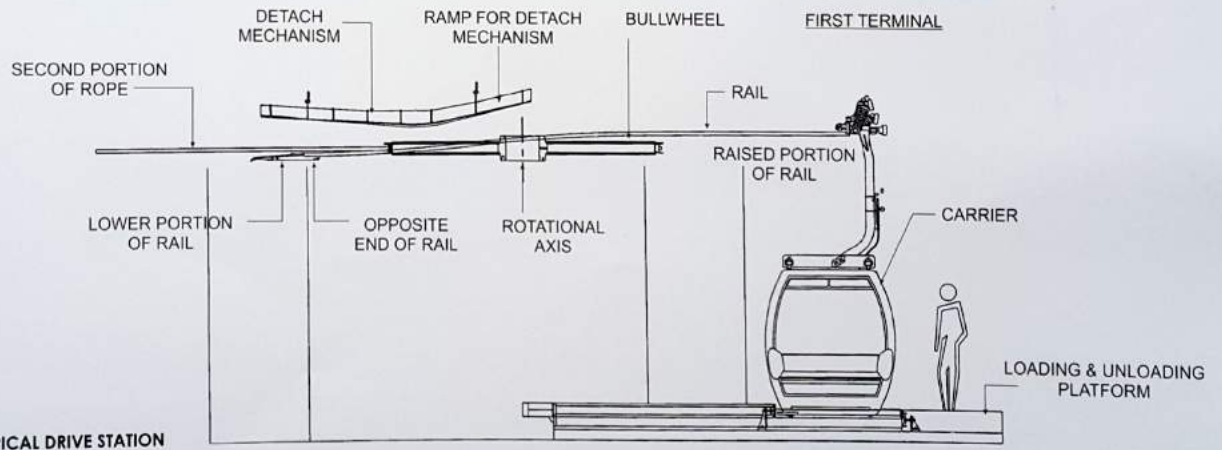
DETAILED PLAN OF PORTION OF A TYPICAL AERIAL ROPEWAY TRANSPORT SYSTEM
